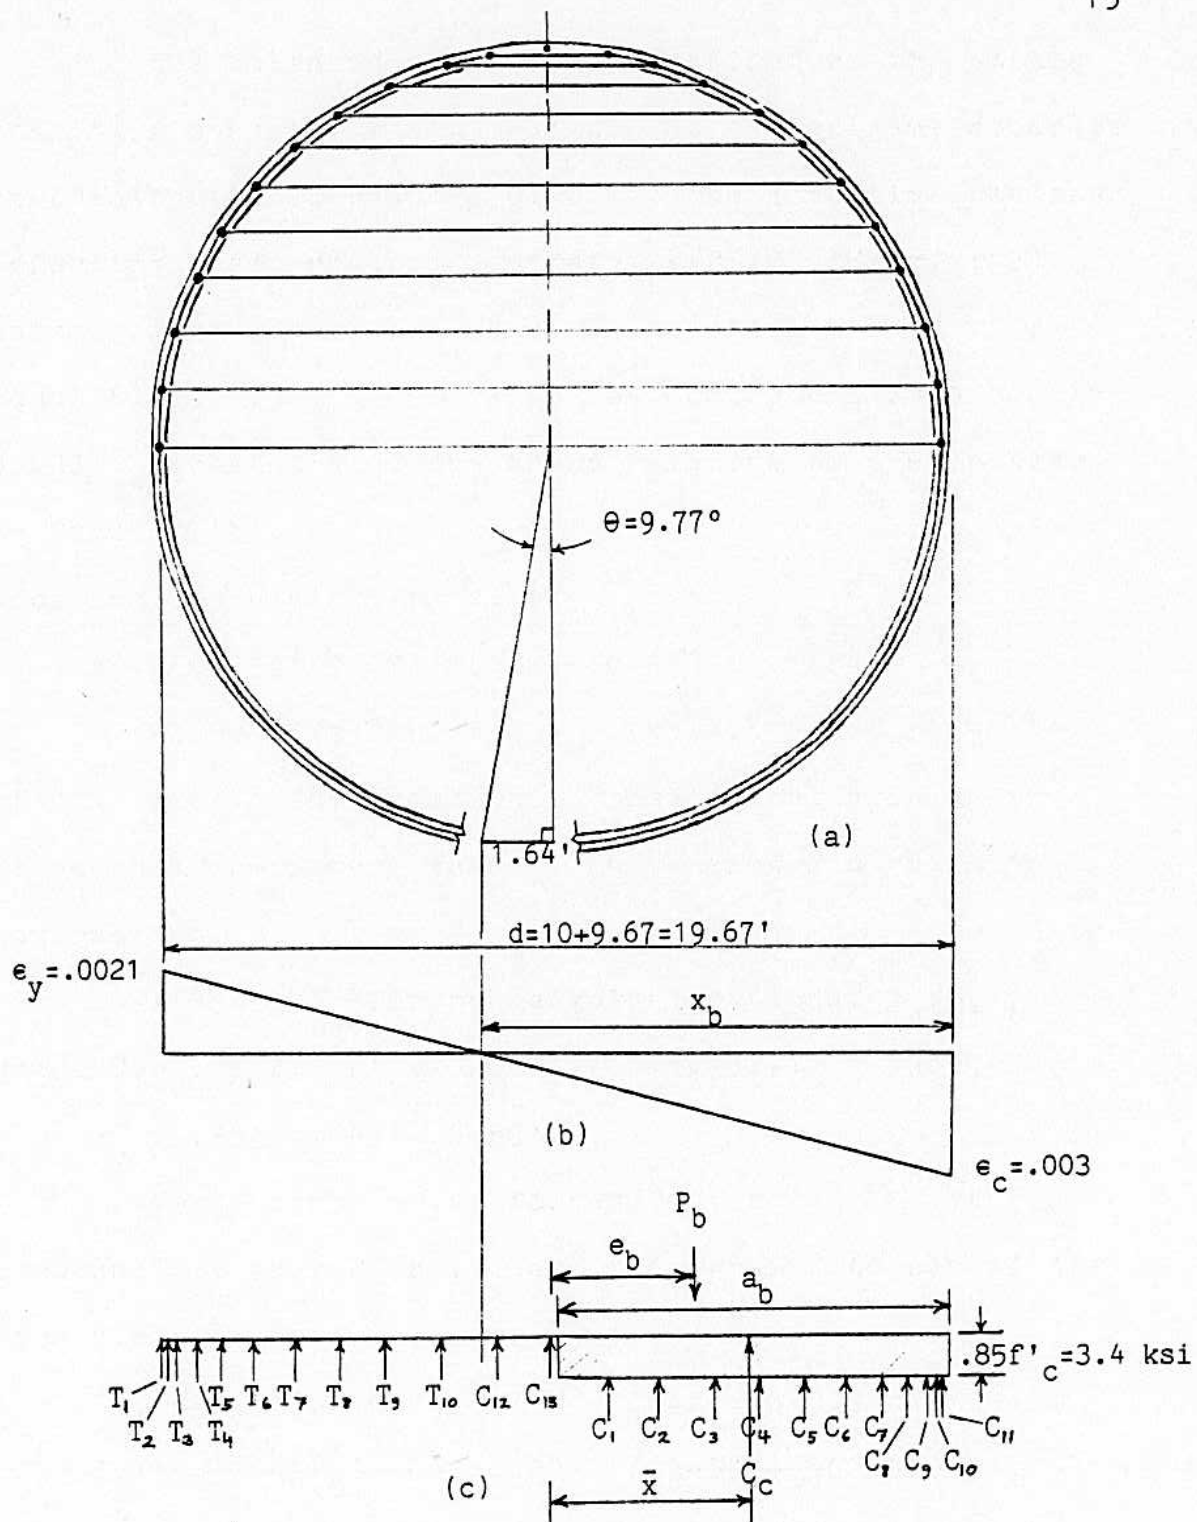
(a) Plan View of Tower Showing Steel (b) Strain Distribution at Balanced Condition (c) Cut Side View of Tower Showing Forces in Steel and Concrete
